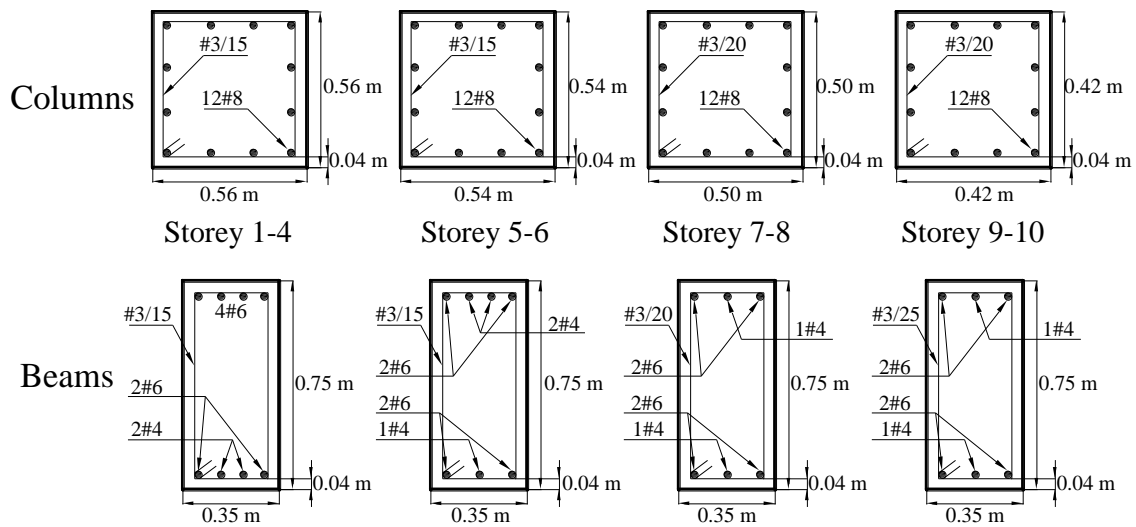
Geometry and reinforcement of the sections (beams and columns).
